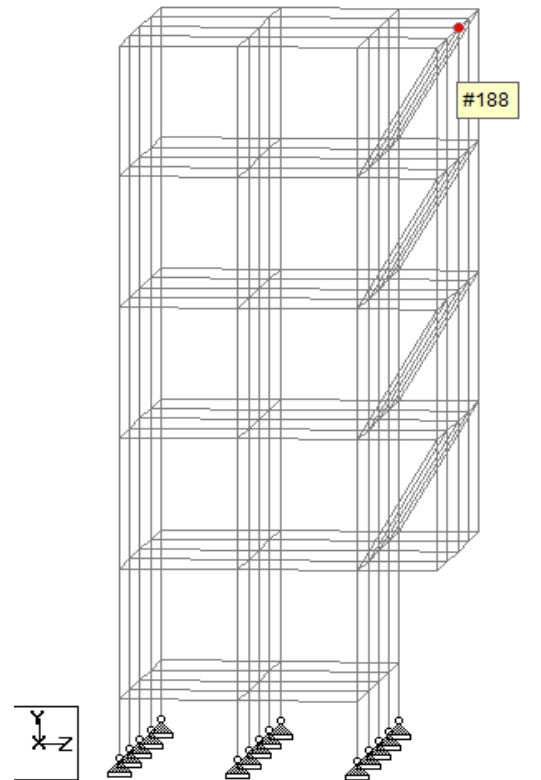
Building Model with overhanging beams with floating columns and single bracing
